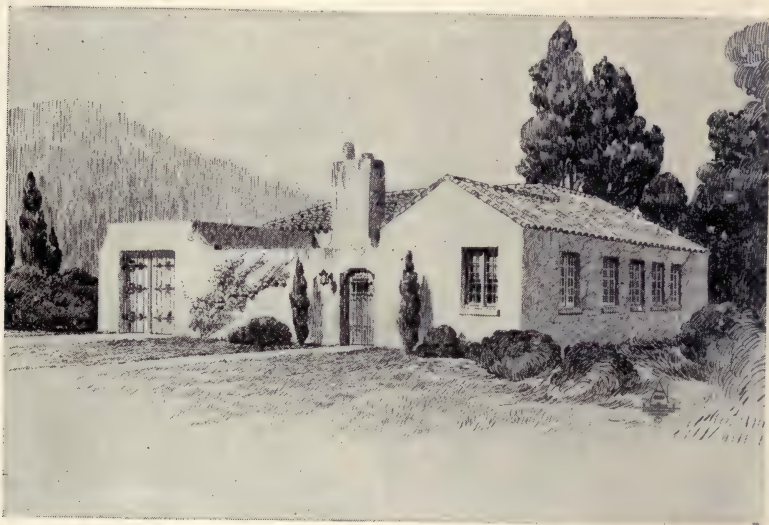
Adapted from Spanish-style architecture with characteristic stucco finish, tile roof, and patio. (Copyright—Architects' Small House Service Bureau, Inc., House Plan 5-B-30.)
